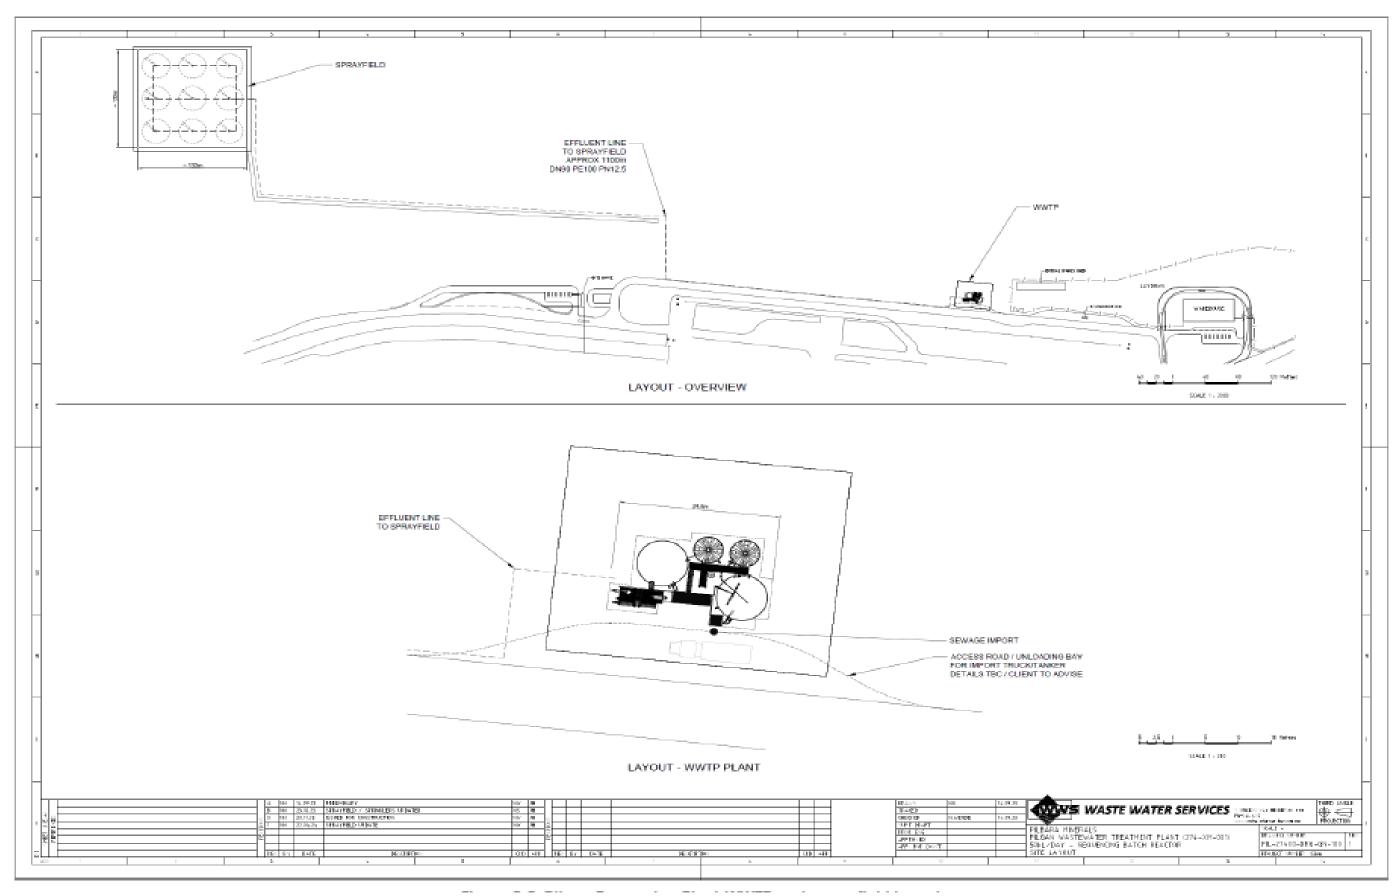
Pilgan Processing Plant WWTP and Spray Field Layout
